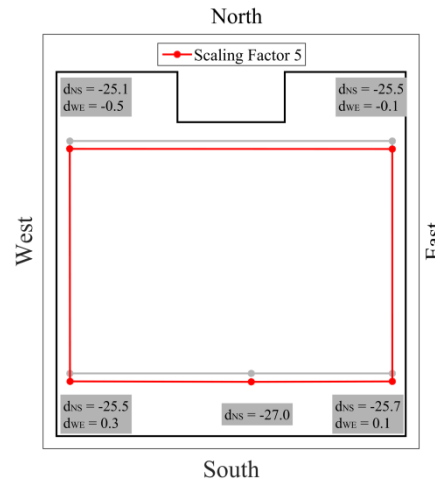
Test #15 EQ-NPR 85% - Second-floor diaphragm deformed shape at maximum average second-floor displacement.
